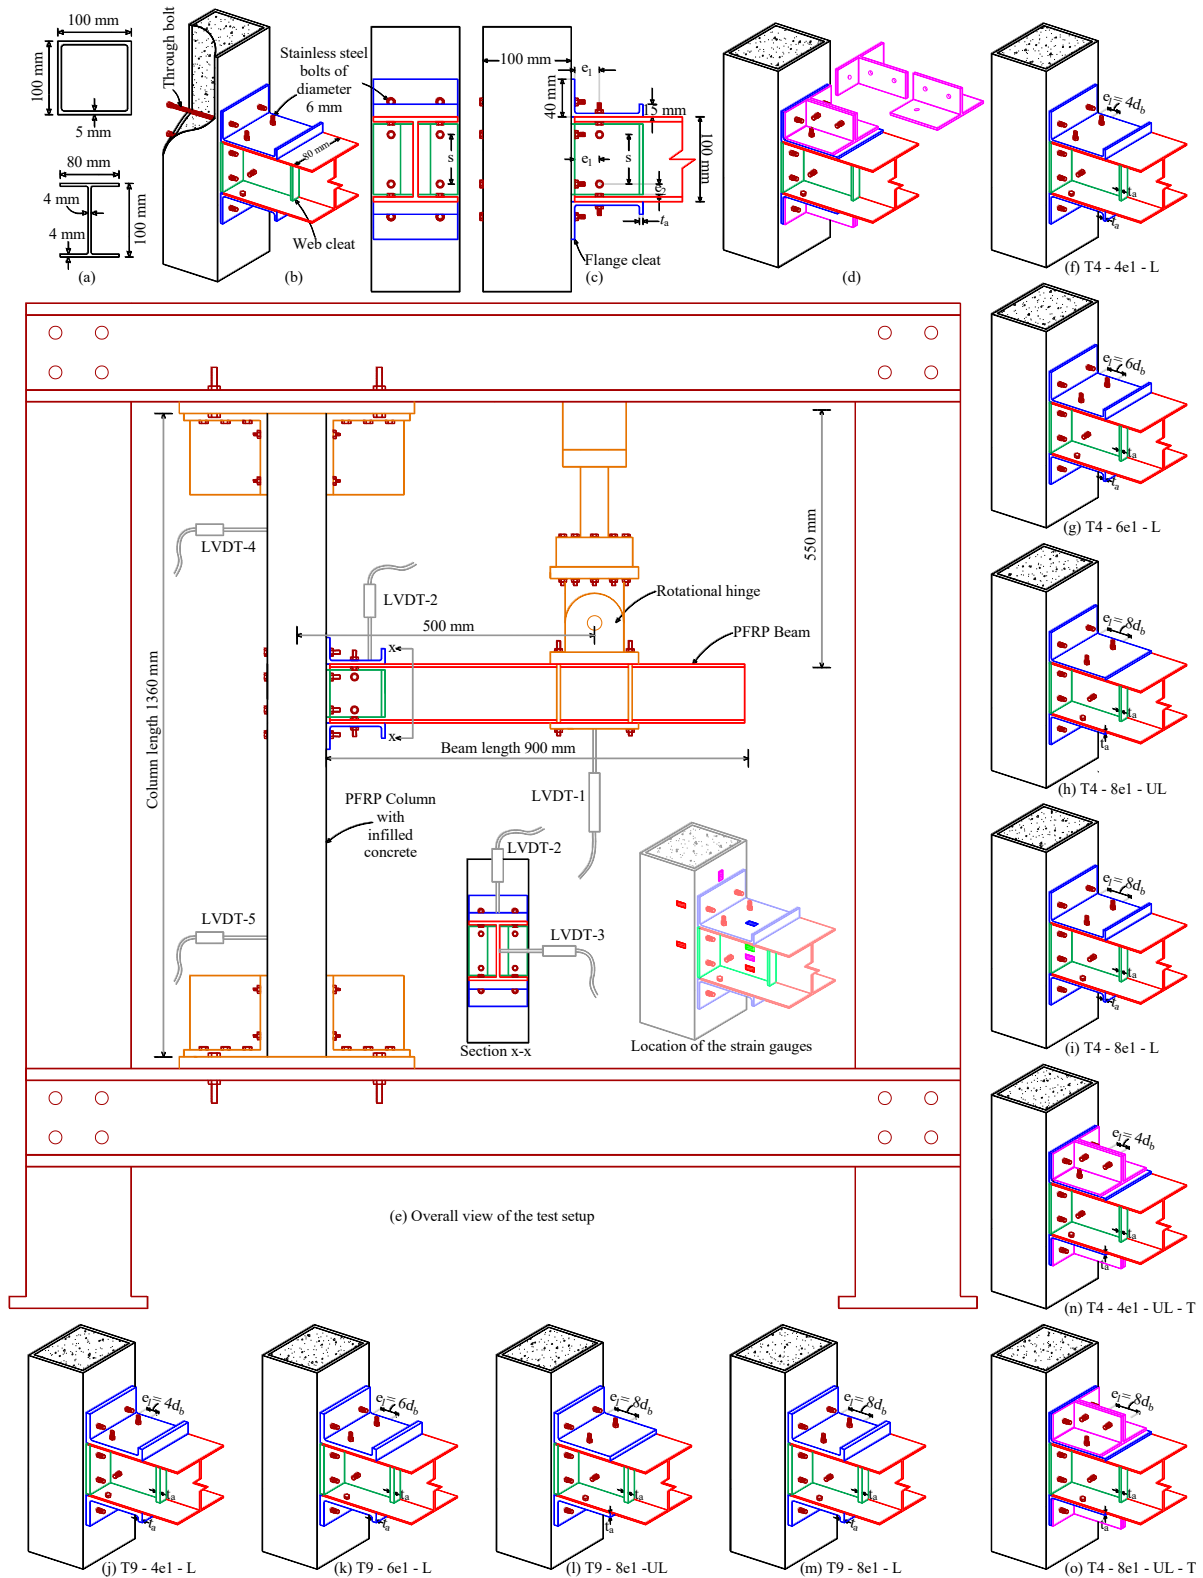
PFRP Beam-to-column joint specimens and testing arrangements: (a) Dimensions of the column (Square tubular section) and beam (I-Section); (b-c) Design dimensions and connection arrangements; (d) Connection with T-Stiffener; (e) Test set-up for beam-to-column joint; (f-o) View of the specimens with varying parameters
